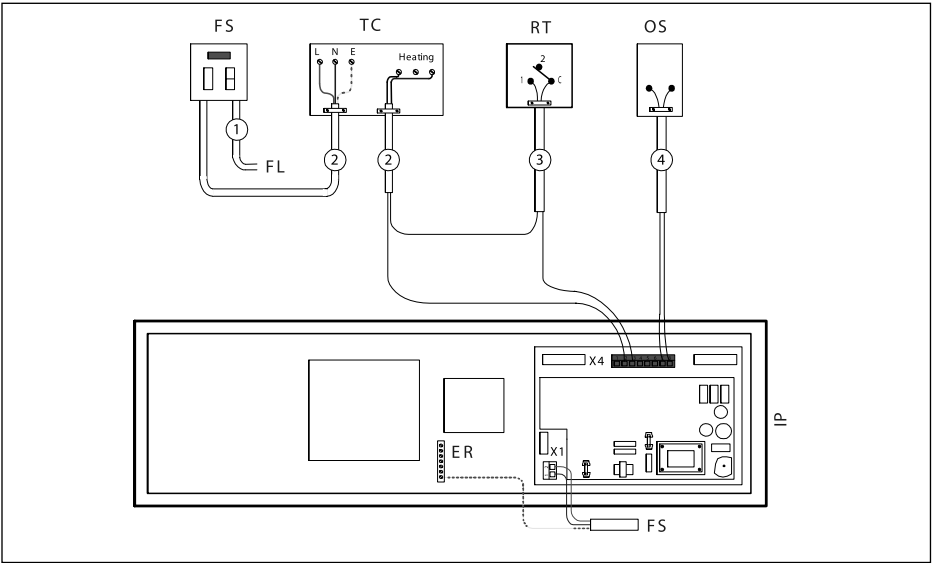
Electrical drawing Selecta combi boiler (use in conjunction with hydraulical drawing Fig. 14)
